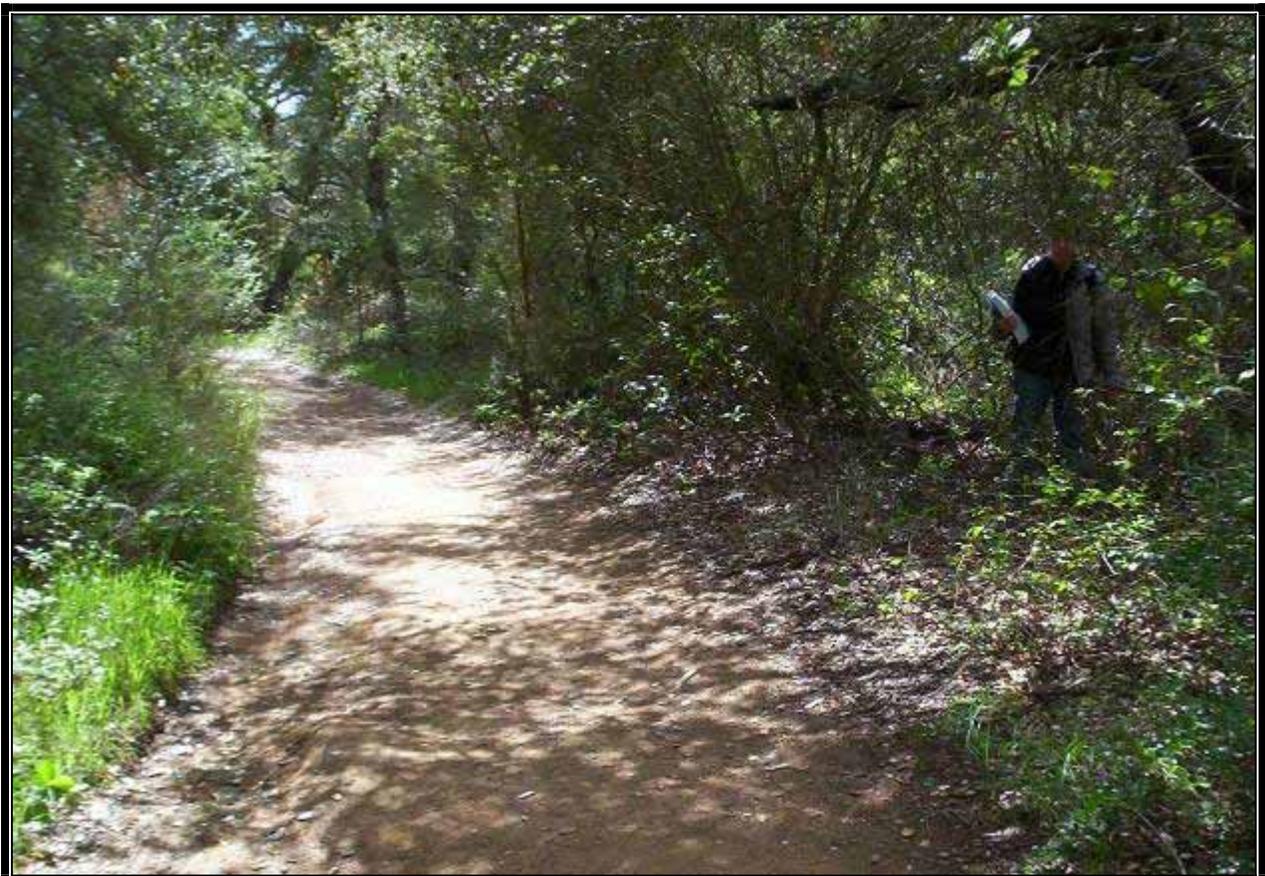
Portion of the 2.4 m (8 ft) wide fire road that would be narrowed to a 1.2 m (4 ft) trail by scraping soils from the bermed, downslope shoulder (right side) and transferring materials to the upslope/inside of the roadway (Gullying and erosion evident in lower left corner of photograph).
